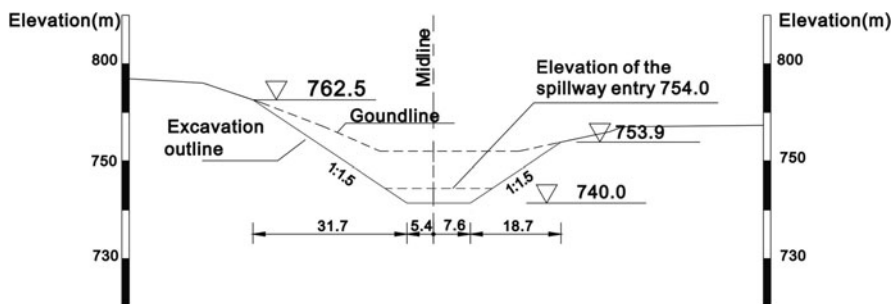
Cross section of the Tangjiashan sluiceway (from [3])
